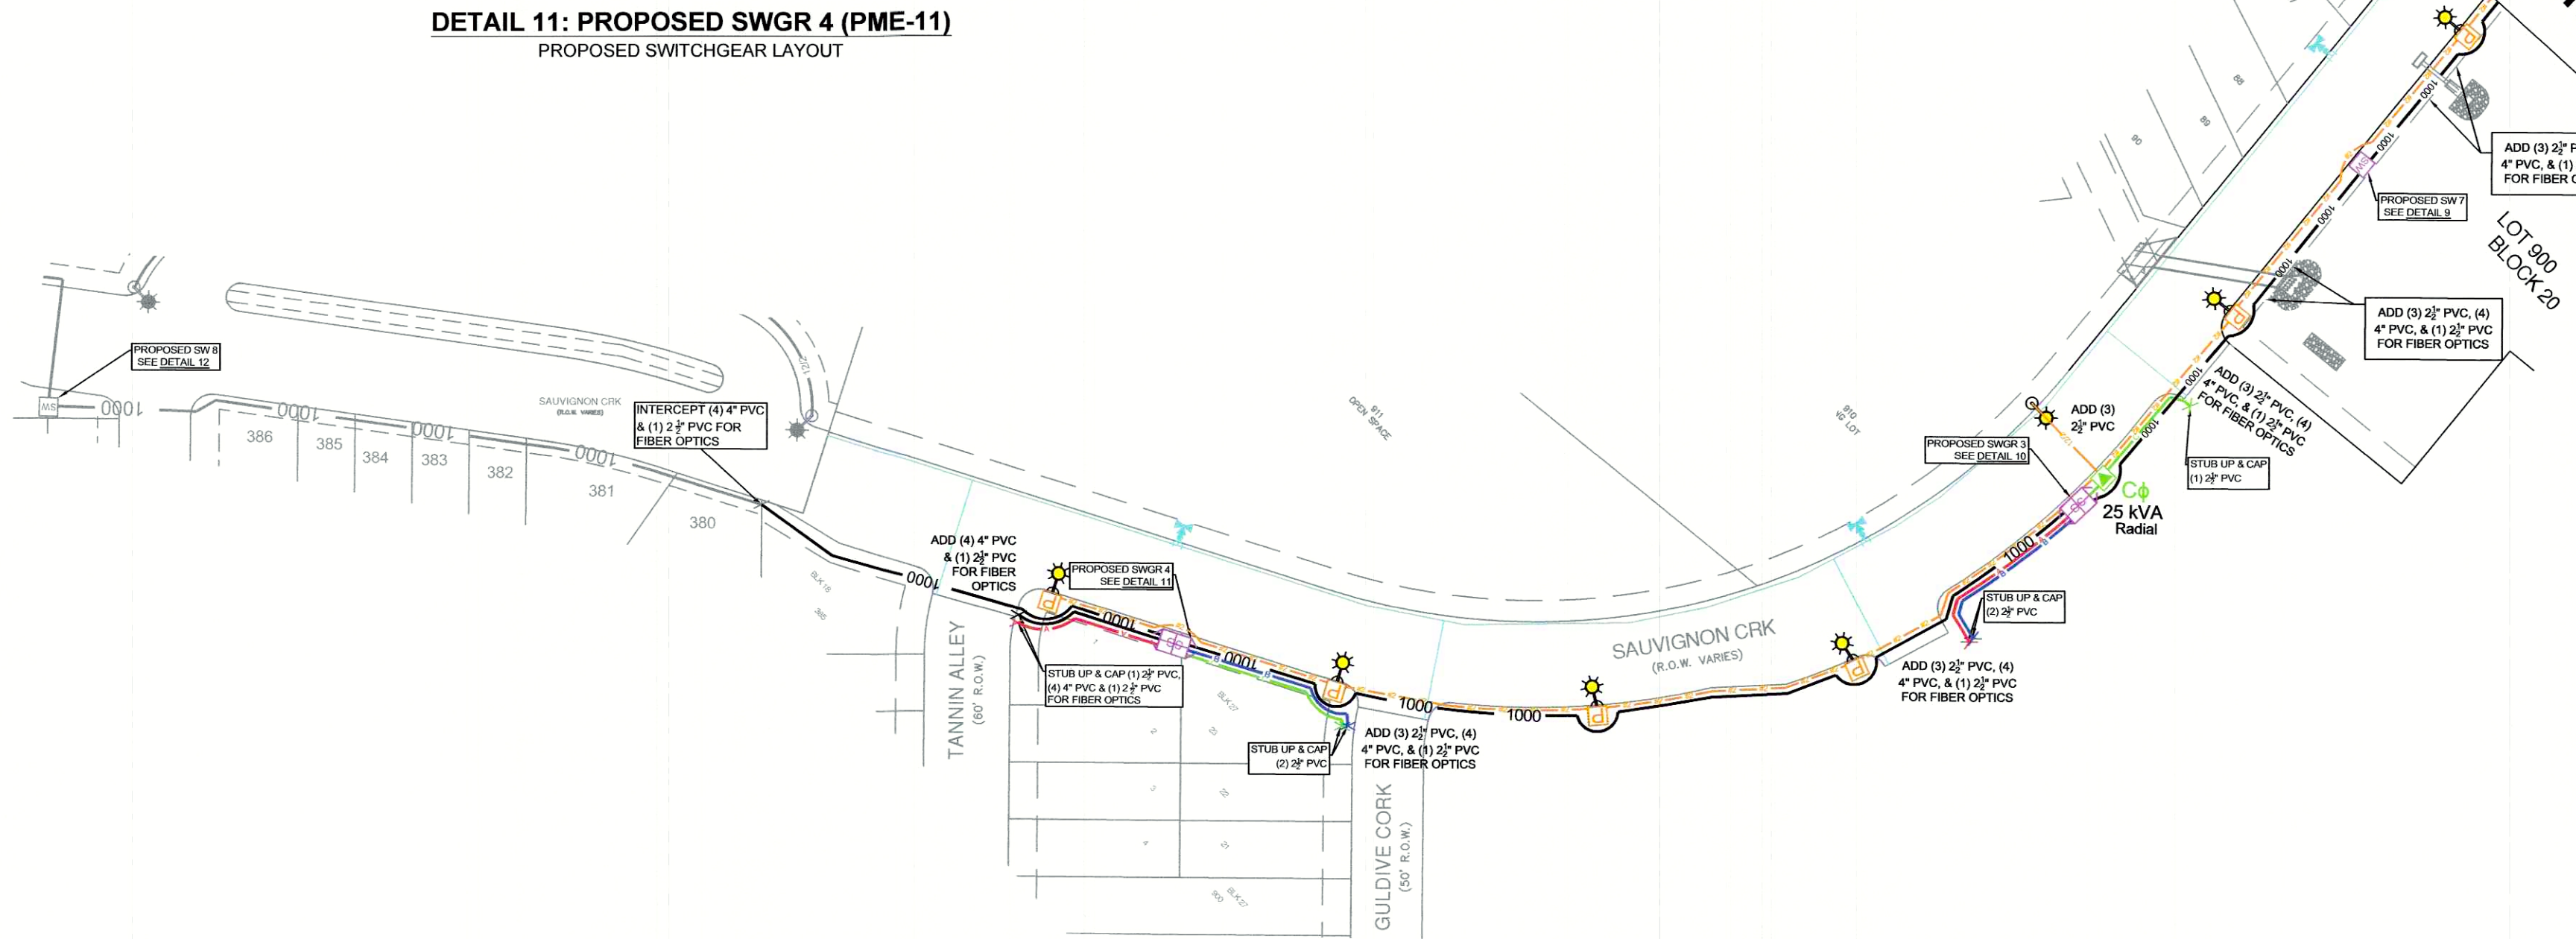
PROPOSED SWGR 4 (PME-11)
